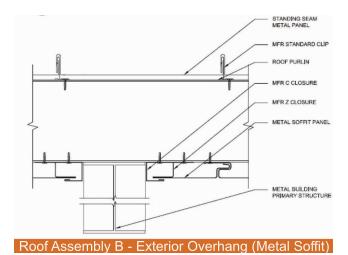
TYPICAL ROOF ASSEMBLIES
